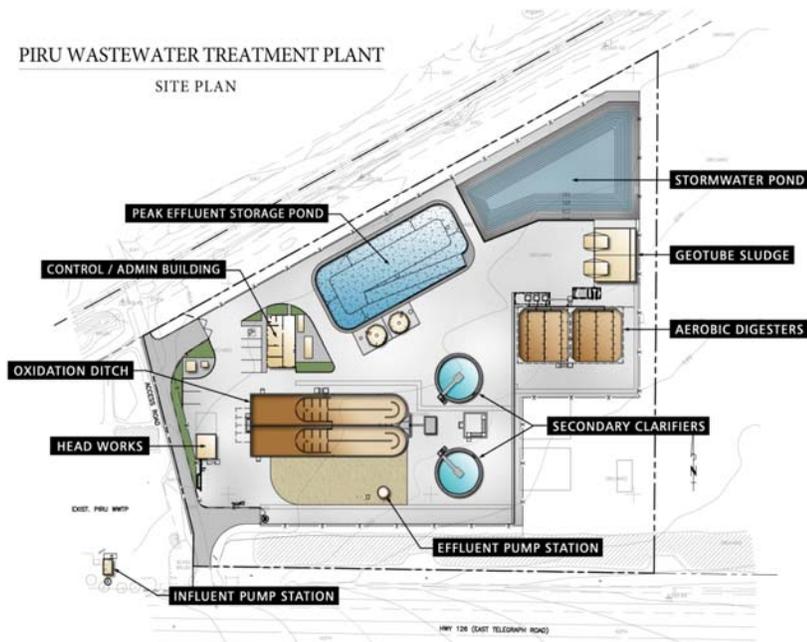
Piru Treatment Plant Tertiary Upgrade Site Plan
